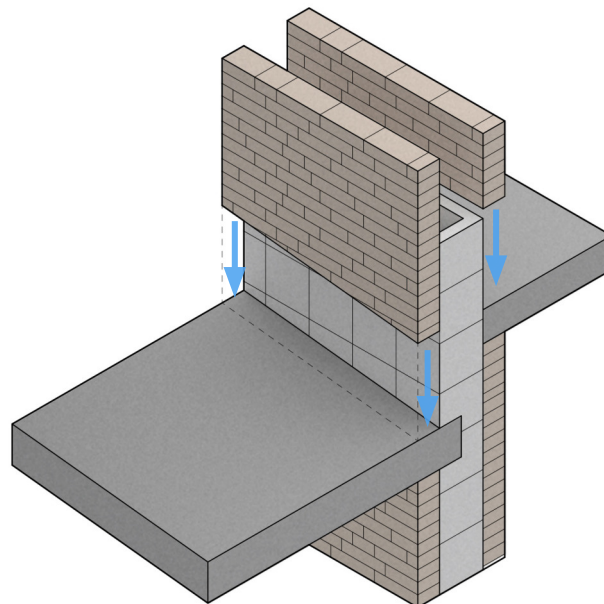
Construction for load-bearing wall and slab of the concert hall
